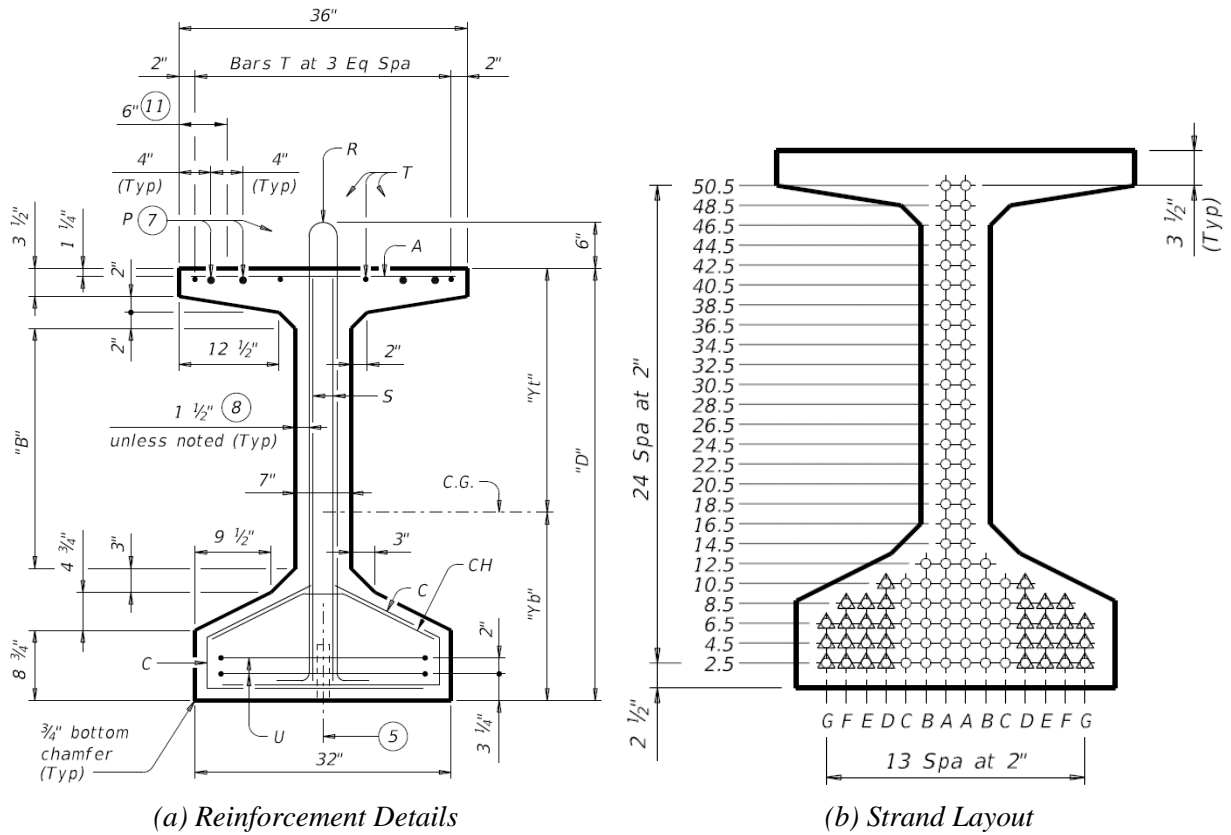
Section Geometry of Tx54 Girder (TxDOT 2019).
